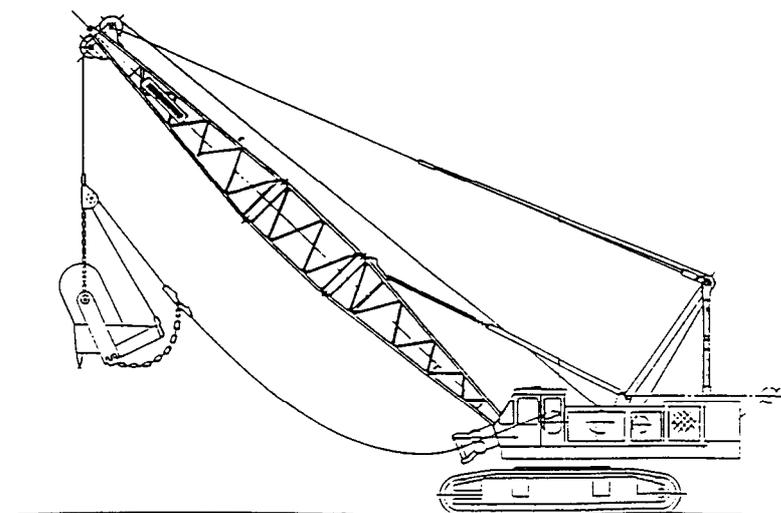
Crawler type cable excavator with dragline equipment
